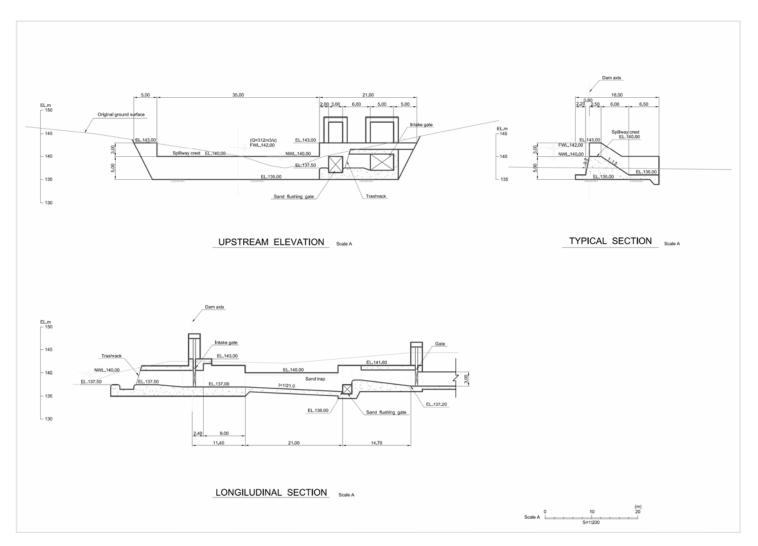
Elevation and Section of No.35-1 Intake Weir
